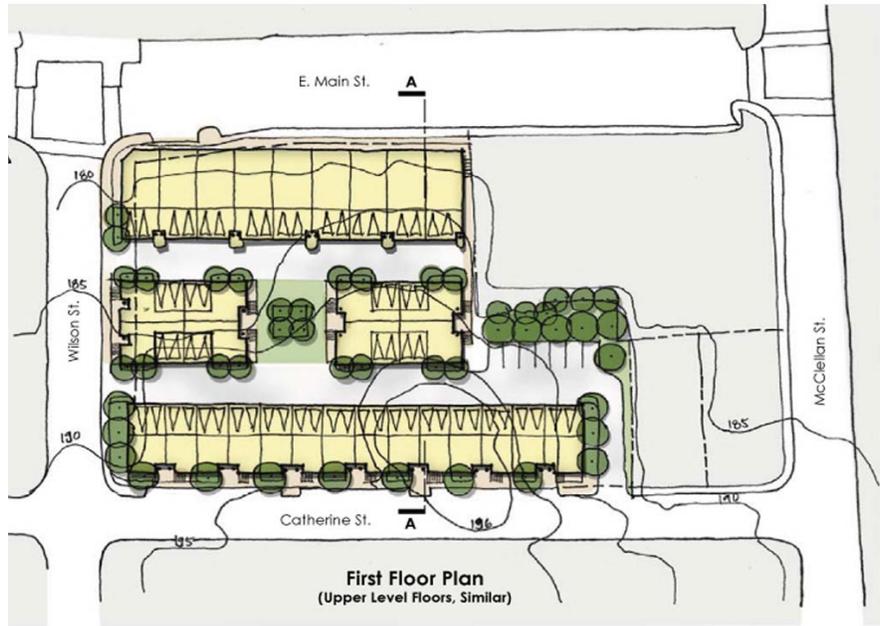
Plans and Renderings, Opportunity Hill Site Scenario 1
